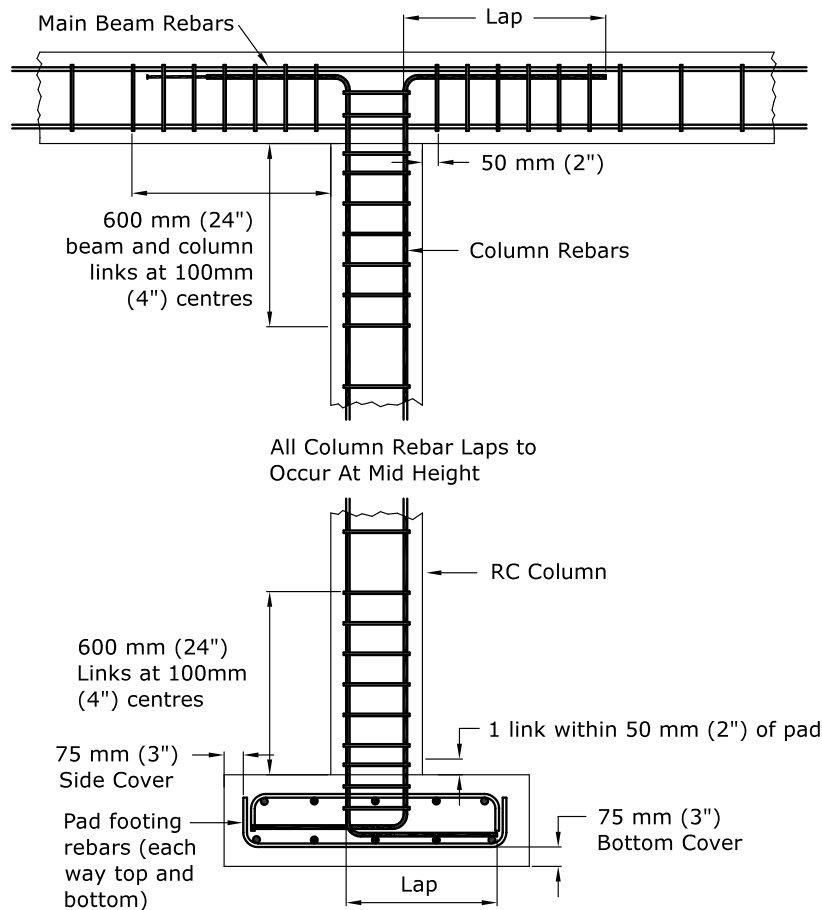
RECOMMENDED DESIGN FOR PAD FOOTING AND COLUMNS
